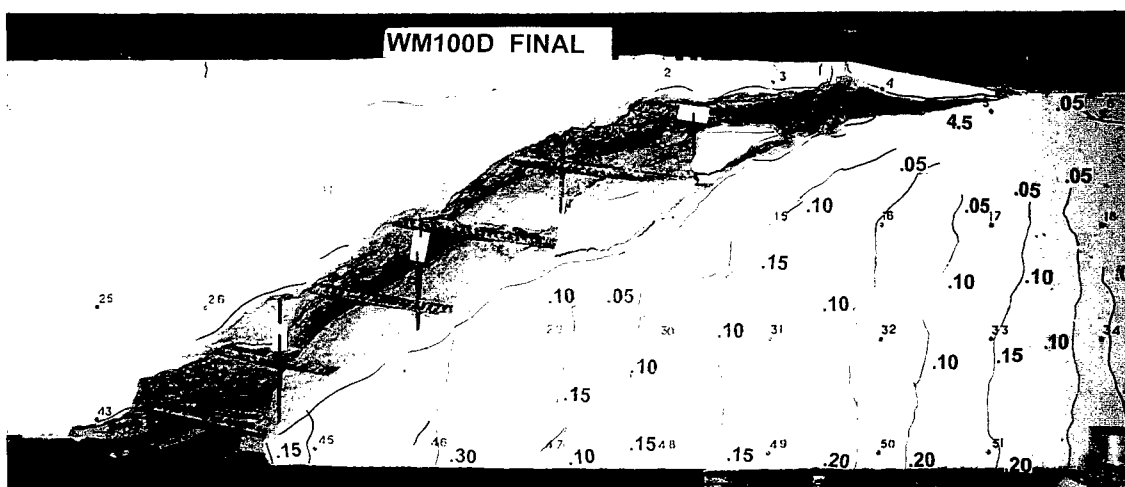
Crack Patterns and Measured Crack Widths (mm) for Specimen WM100D
